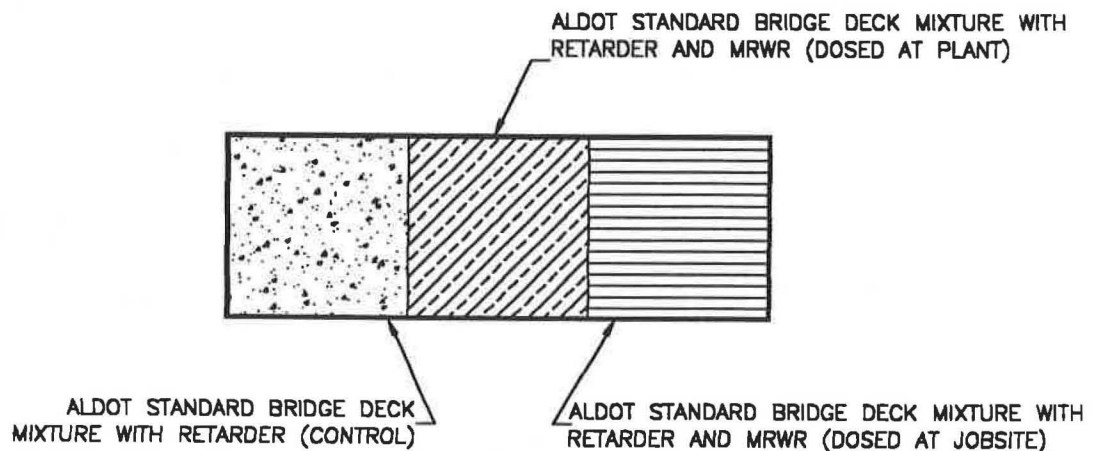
Three Span Test Bridge Deck - Summer 2001 Placement
